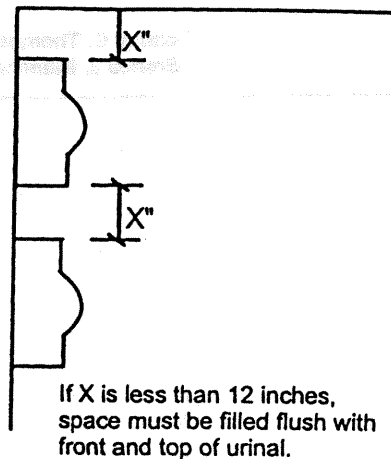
Spacing between wall hung or stall type urinals.
